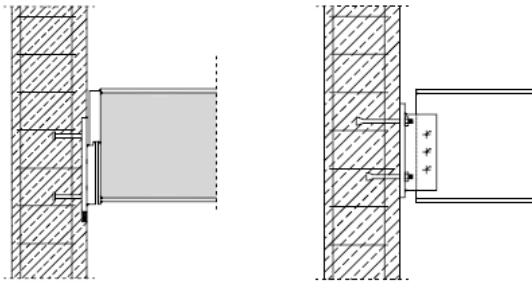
(a) Anchor plate with welded studs and cam as high performance anchors support of steel beams and welded flag plate as with small nose for support of steel beam horizontal support
